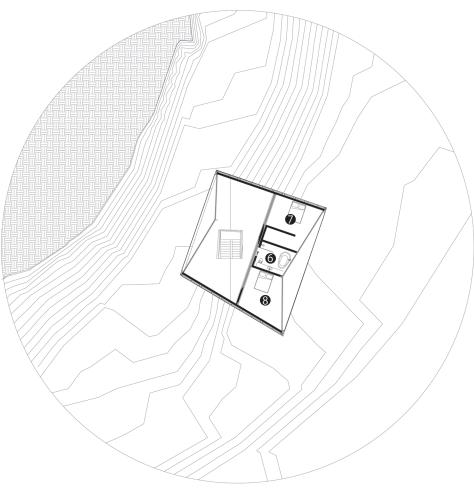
House 3 plans, Scale: 1:400 at A4 1:200 at A2
